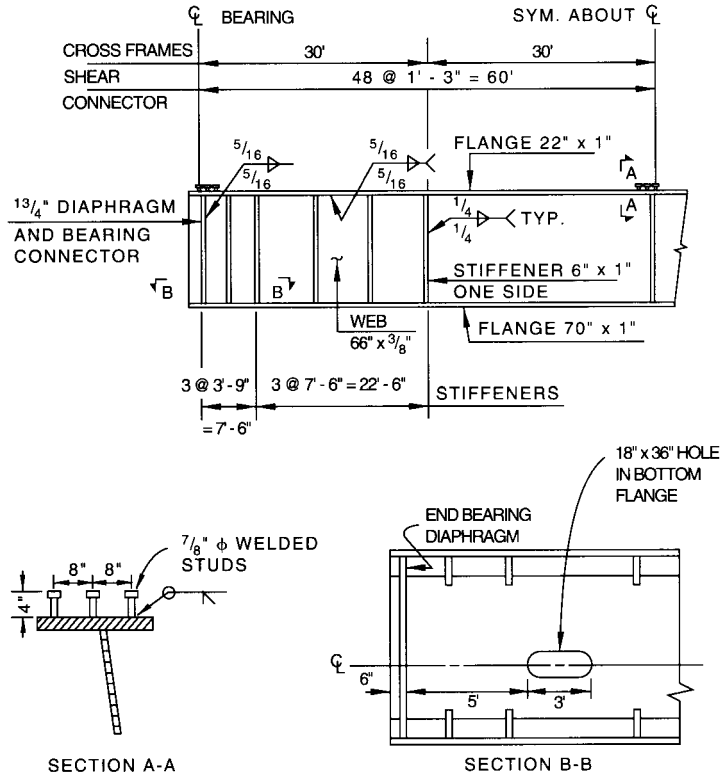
Locations of stiffeners, cross frames, and shear connectors for composite box girder.
